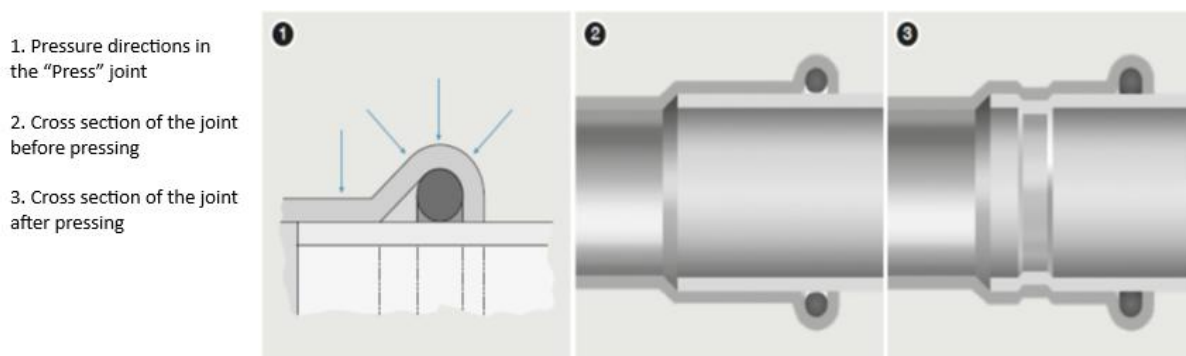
Cross-section of a joint in the KAN-therm Steel system
